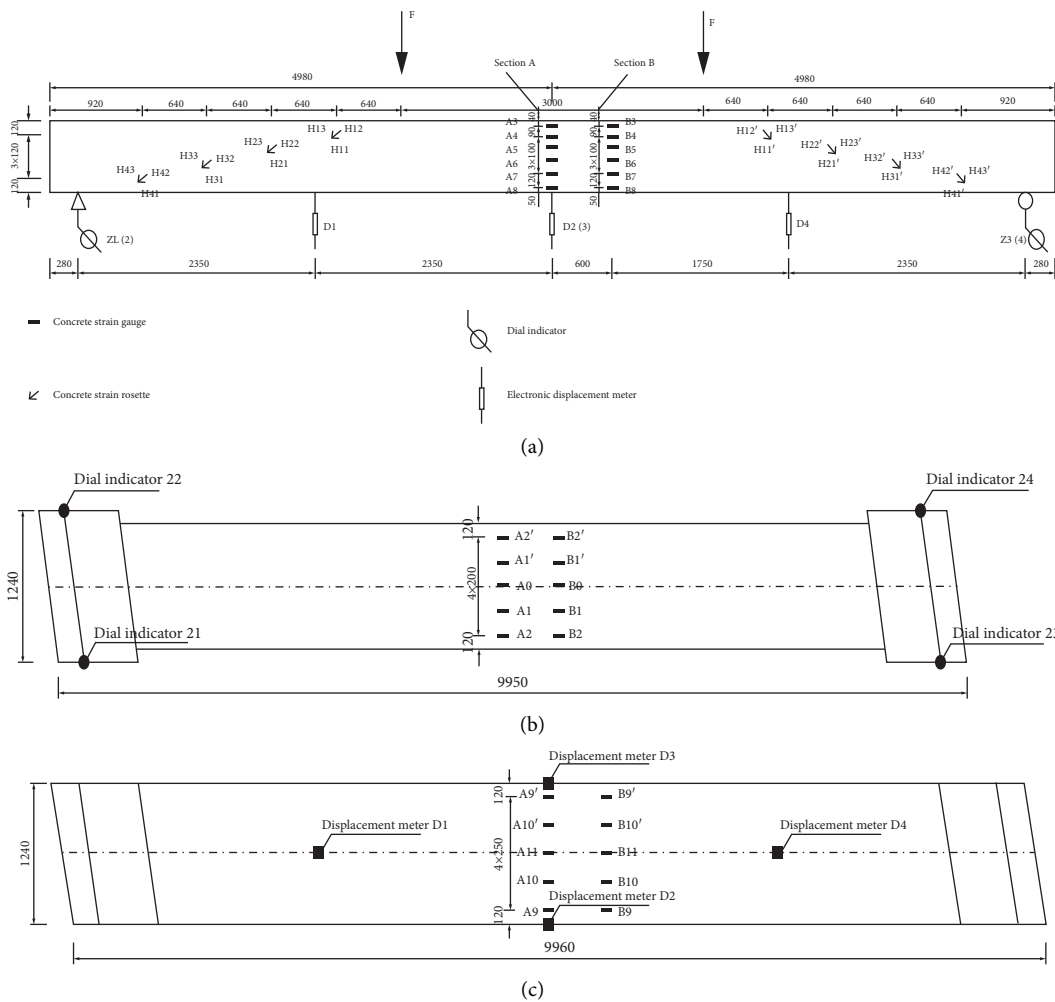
Layout of measuring points on the sample. (a) Elevation of the specimen. (b) Top view of the specimen. (c) Bottom view of the specimen.
